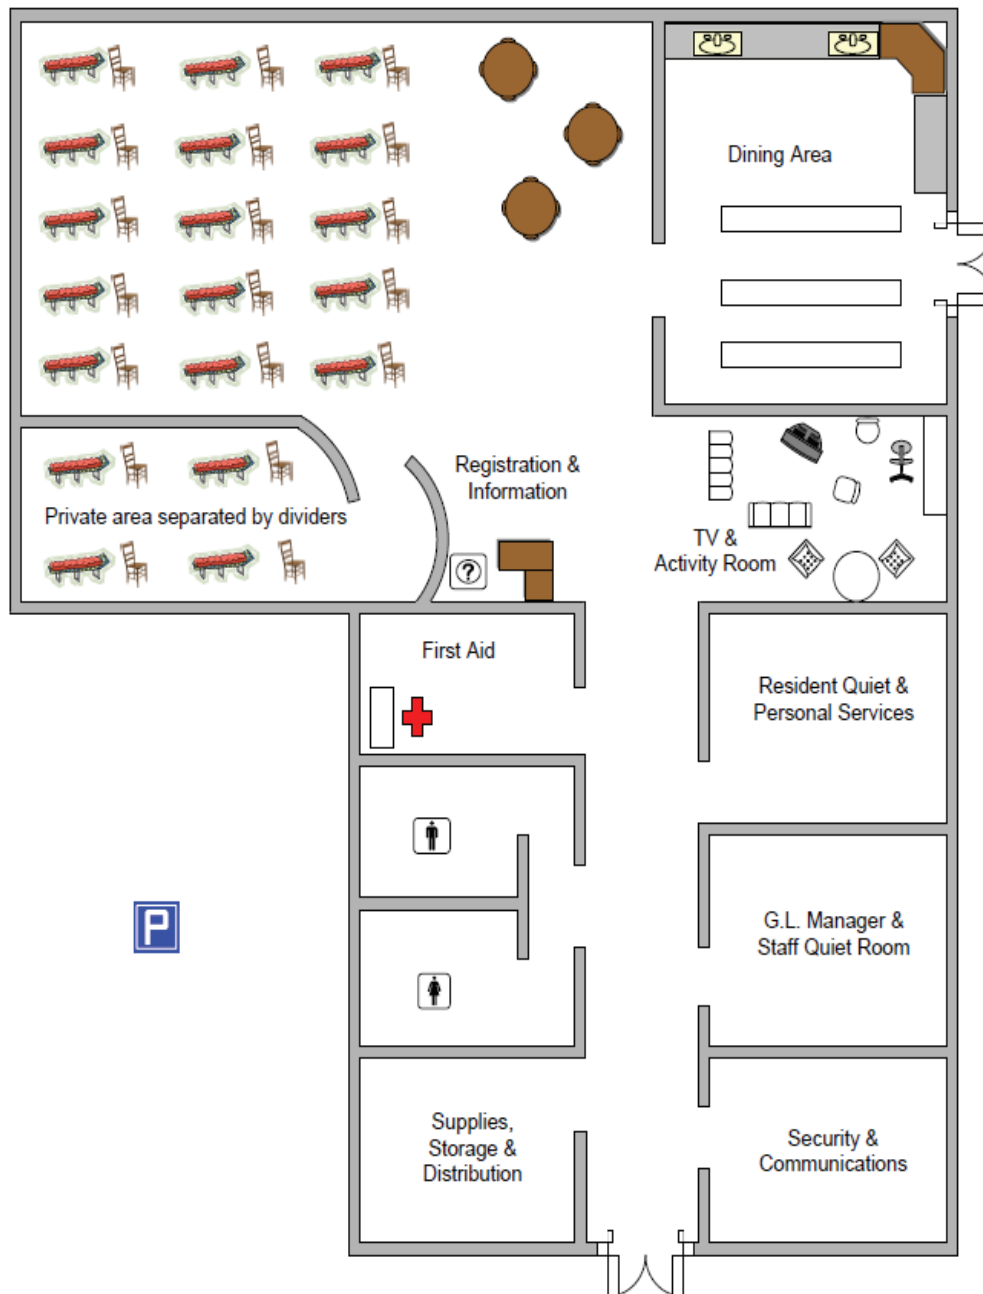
Sample Group Lodging Floor Plan with Rooms (PPT slide 14)
